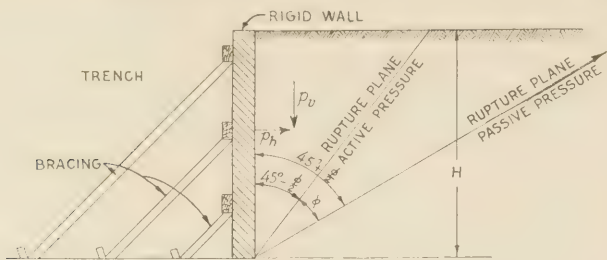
SCHEMATIC DIAGRAM SHOWING EARTH MASS, RETAINING WALL, AND RUPTURE PLANES.
